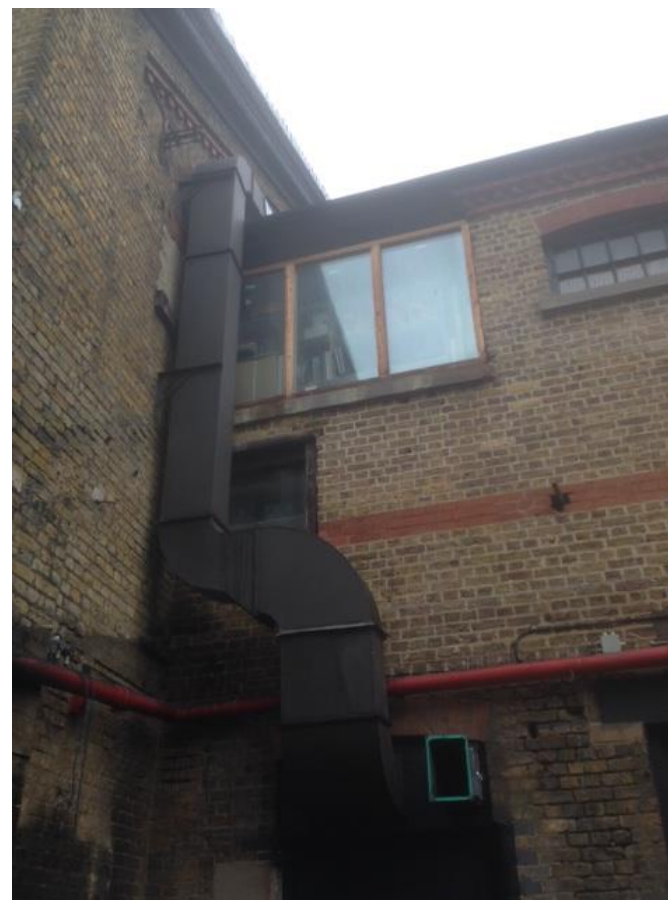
2016 photograph showing the extract duct routing through the fanlight and over the roof eaves.
